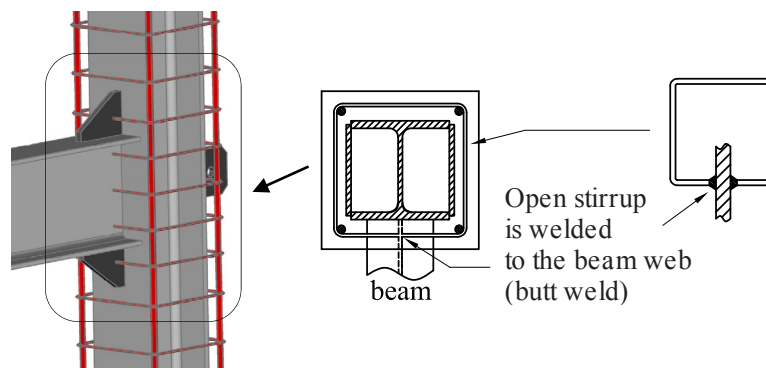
Detail of composite column transverse reinforcement in the region of the beam-to-column connection
